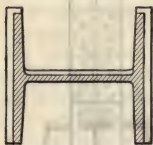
Section of Bethlehem H Column Showing Variation in Area
